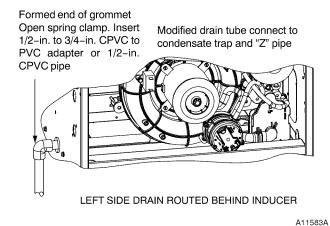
Drain Trap Connection and Routing (Appearance May Vary)
